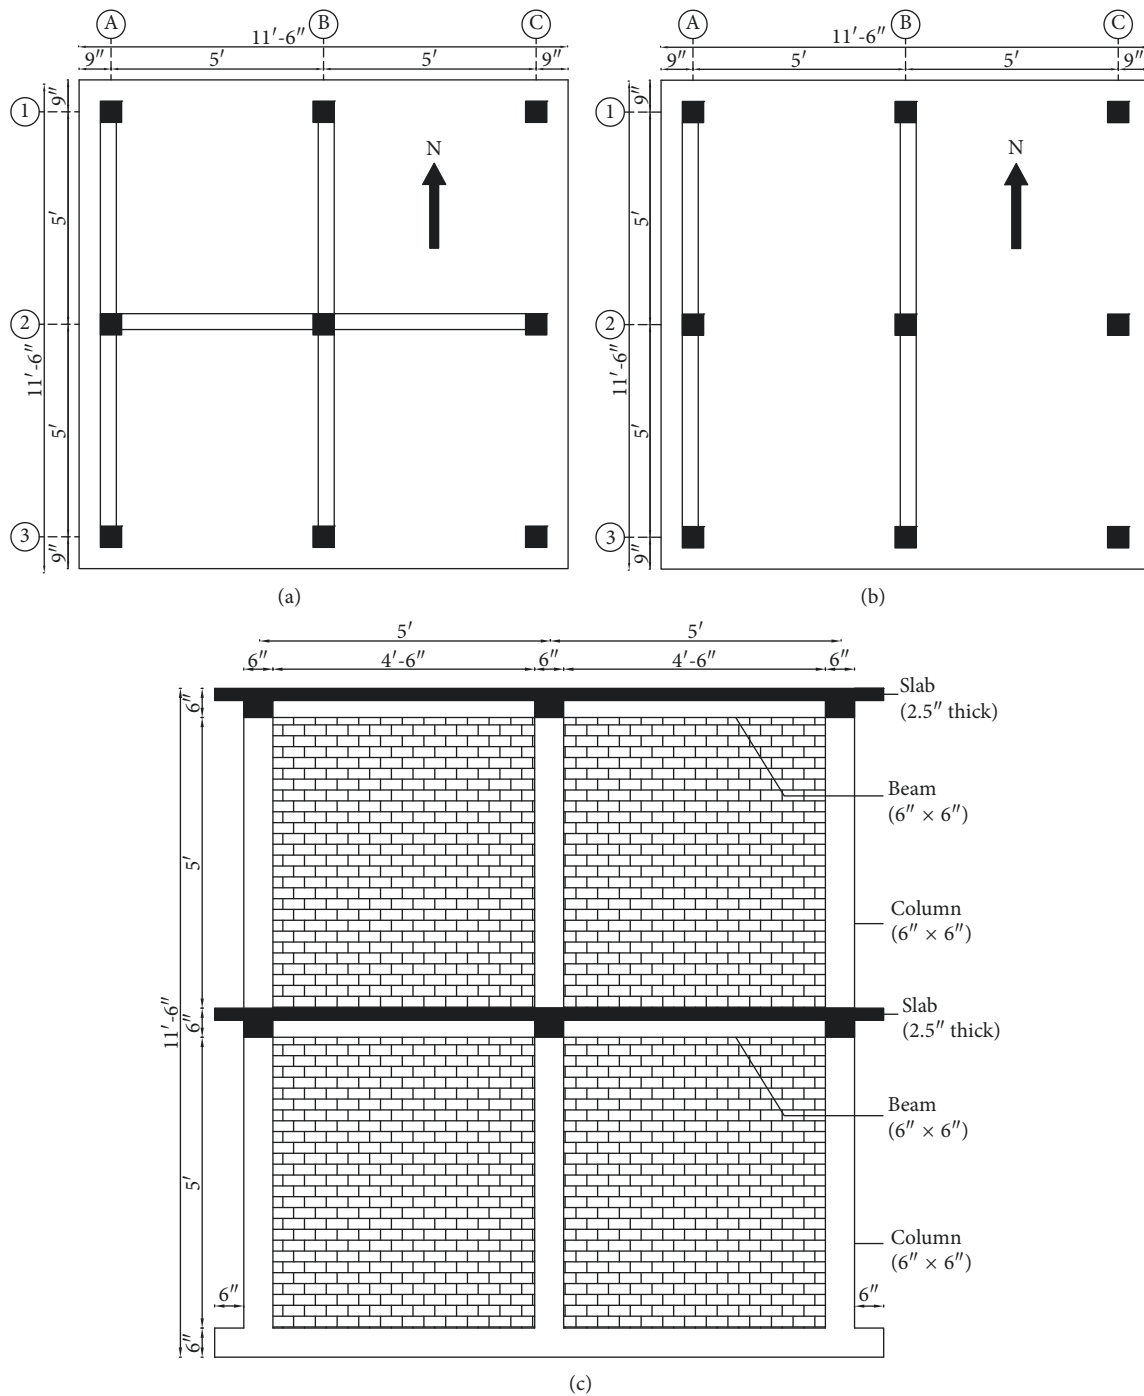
Plan and elevation view of the test specimen. (a) First-storey wall layout plan. (b) Second-storey wall layout plan. (c) Elevation view of the interior frame.
